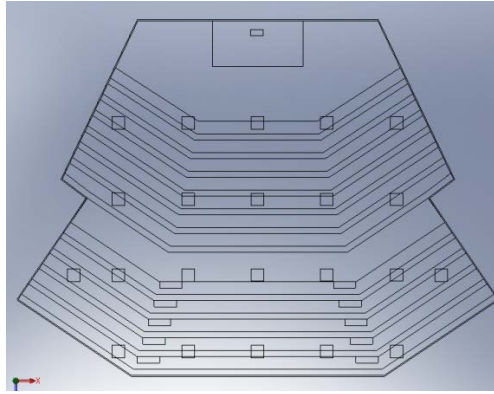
Layout plan for DK2 with diffusers and return air duct.
